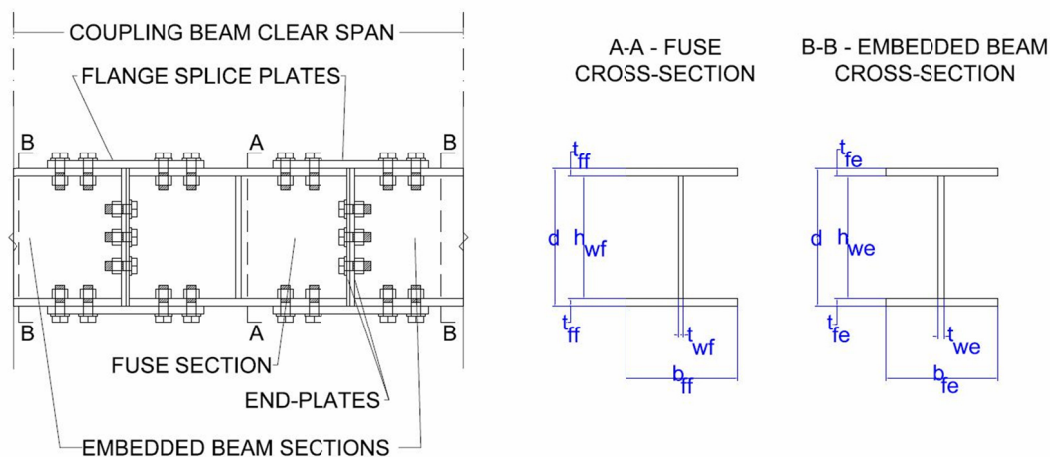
Assembly of a SFCB and dimensions to proportion
